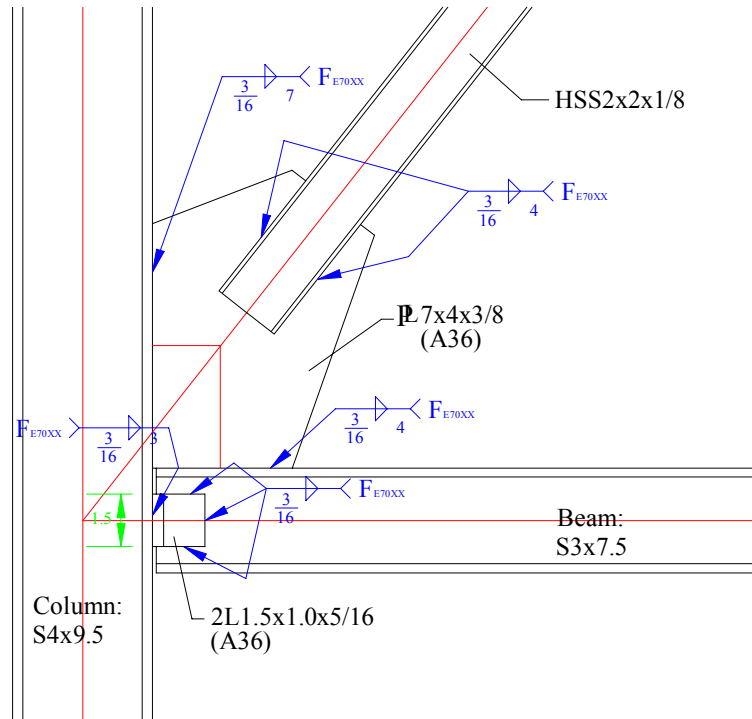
Details of the 2nd-floor brace-beam-column connection.
